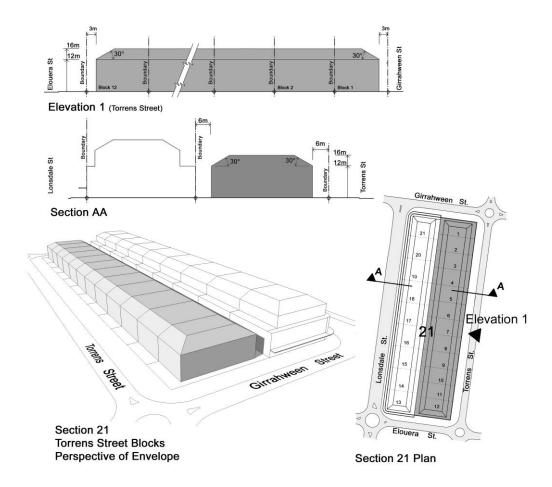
Building Envelope Diagram - Braddon section 21 blocks 1-12
